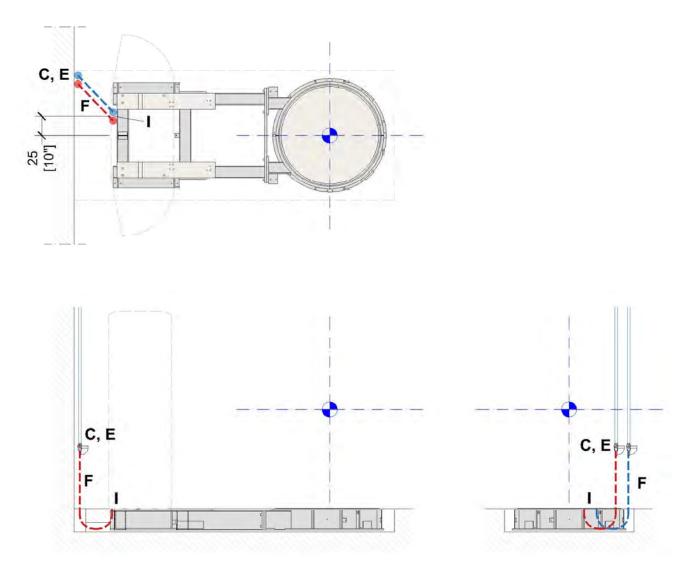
Cooling Line Access – Plan, Side, and Front
